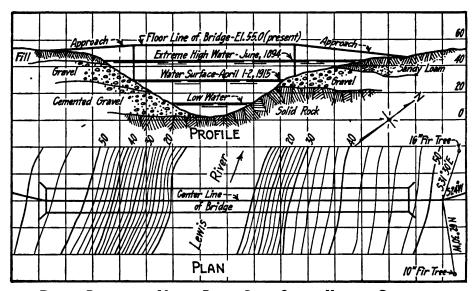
Profile and Map of Bridge Site. Oregon Highway Commission.
